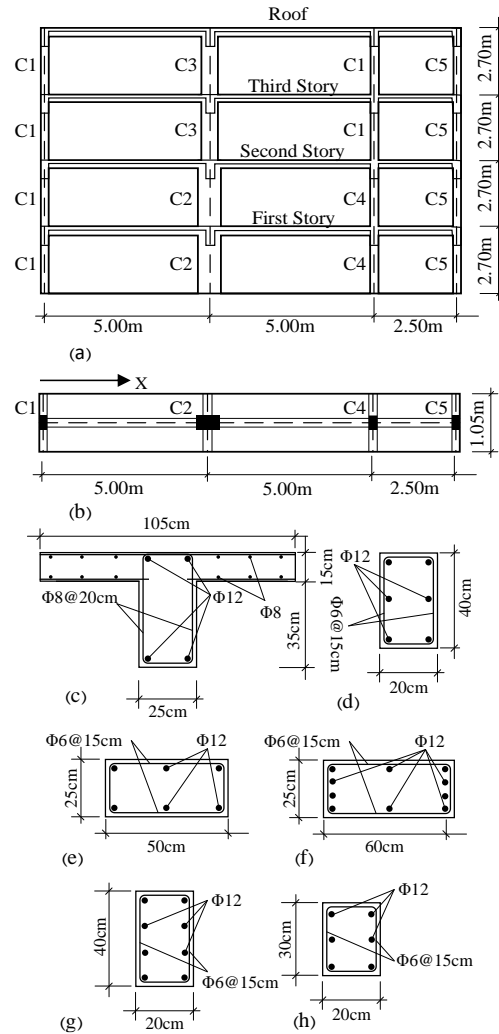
a) Elevation view; b) plan view; c) T-shape beam section, and sections of column: d) C1; e) C2; f) C3; g) C4; and h) C5 in laboratory concrete frame
